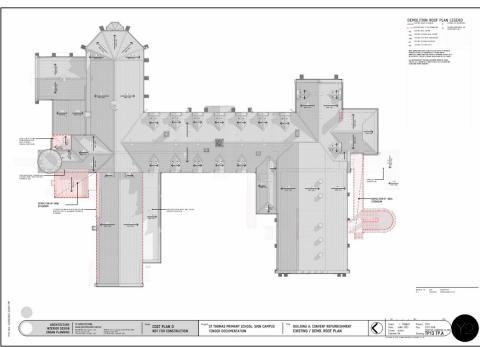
Roof plan demolition plan (Source: Y2 Architecture)
